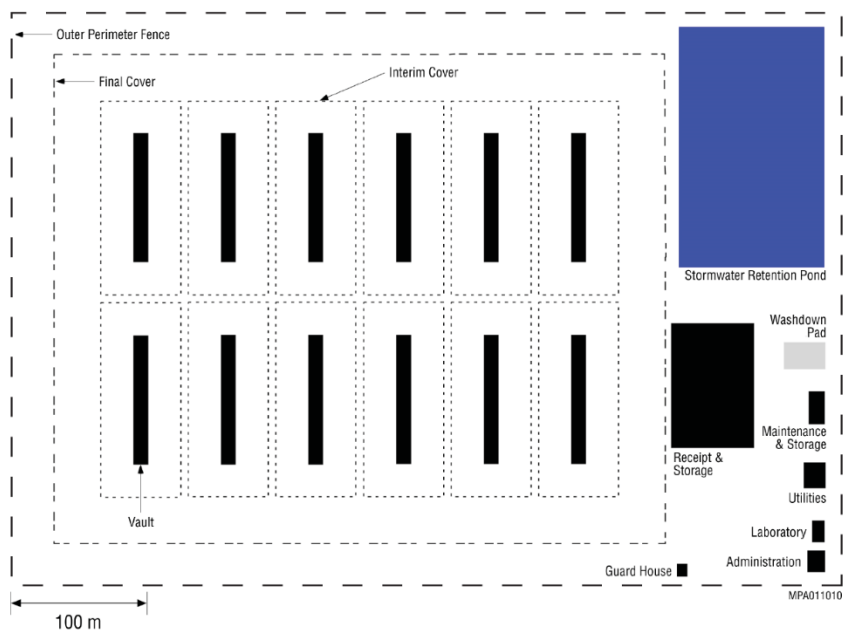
Layout of a Conceptual Vault Disposal Facility
